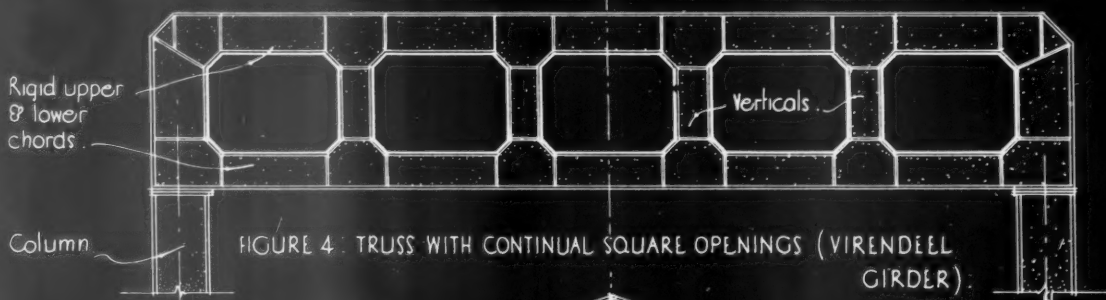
TRUSS WITH CONTINUAL SQUARE OPENINGS (VIRENDEEL GIRDER).
